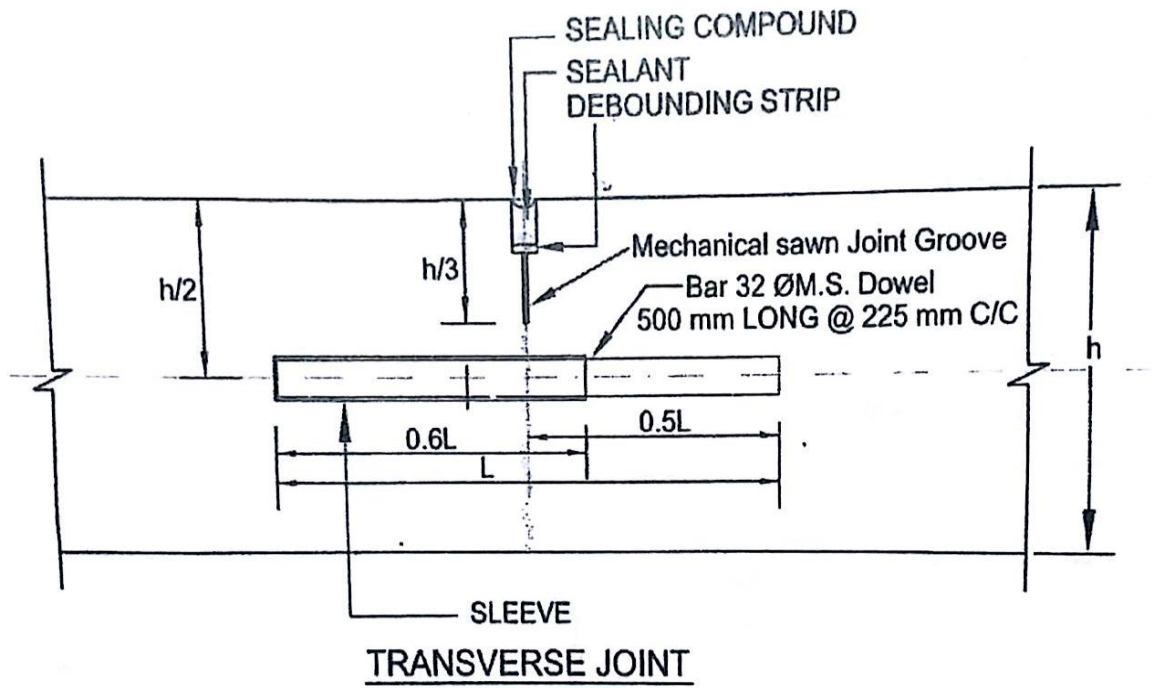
Section of transverse joint in Pavement Quality Concrete (PQC)
